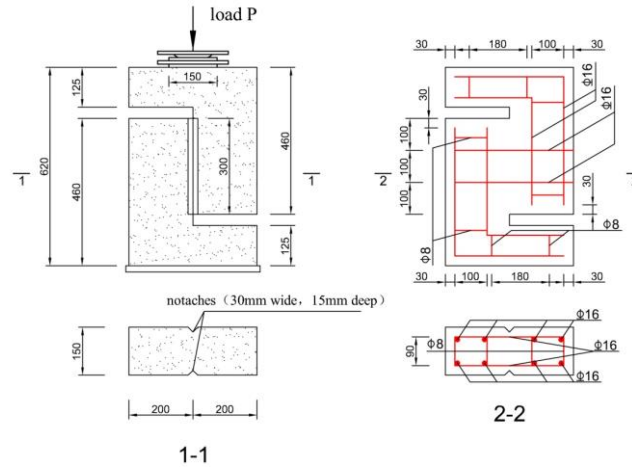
Geometry details and reinforcement arrangement of the Z-shape component (mm)
